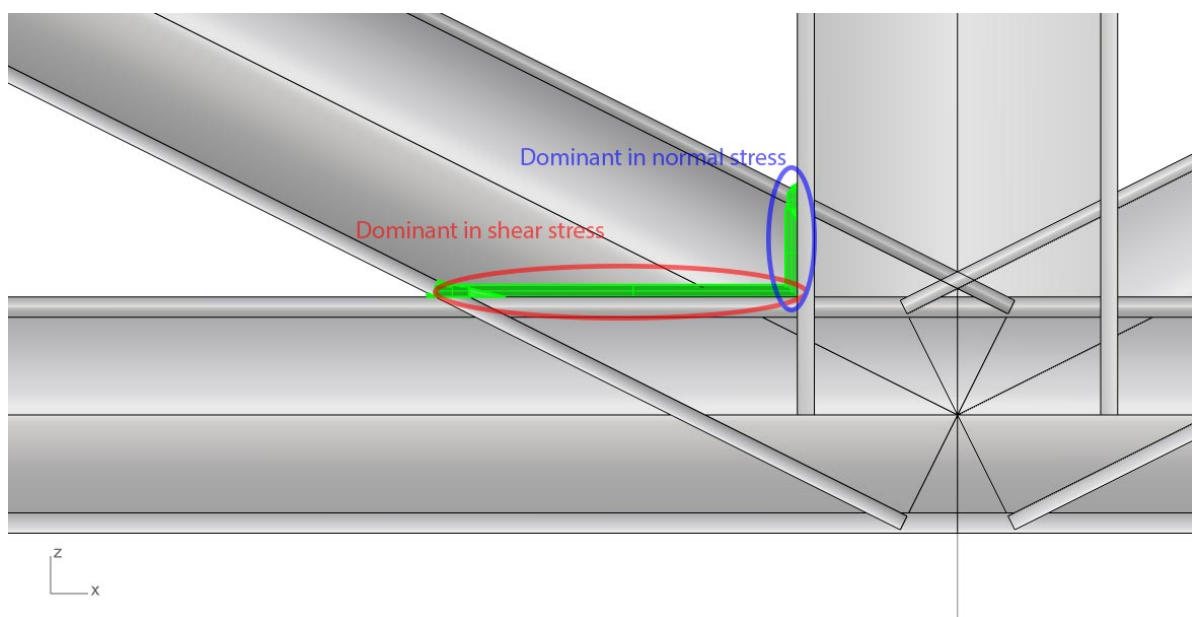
Web weld I section diagonal with two cutting planes
